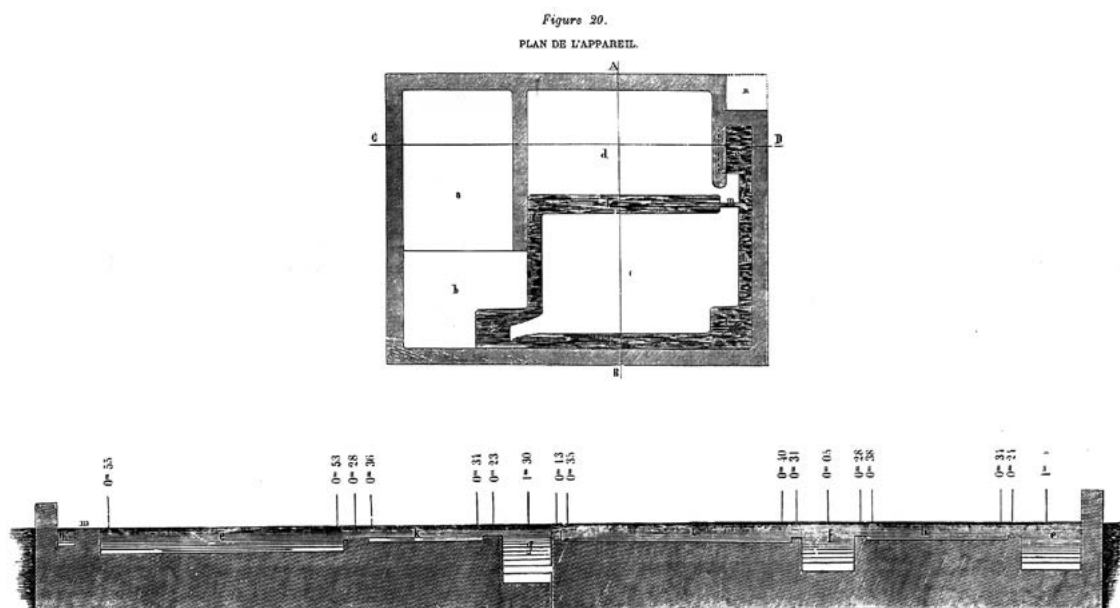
Laurion. Flat bedded washery according to Cordella (1869, p.95 fig.20 plan, p.97 fig.23 section).
